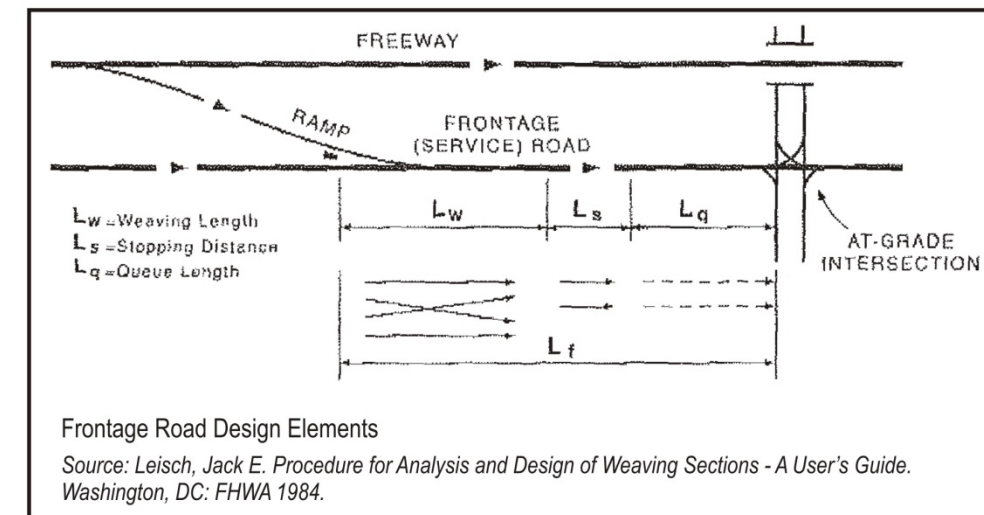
, Frontage Road Design Elements Approaching Crossroad Intersection
